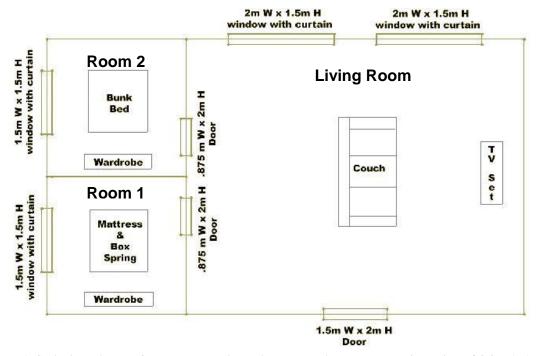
Smith's residence floorplan and dimension. Room A and B have dimension of 3.3 m(W) x  $3.25 \text{ m(L)} \times 2.75 \text{ m(H)}$ . Living room has dimension of 8 m(W) x  $6.5 \text{ m(L)} \times 2.75 \text{ m(H)}$ .
